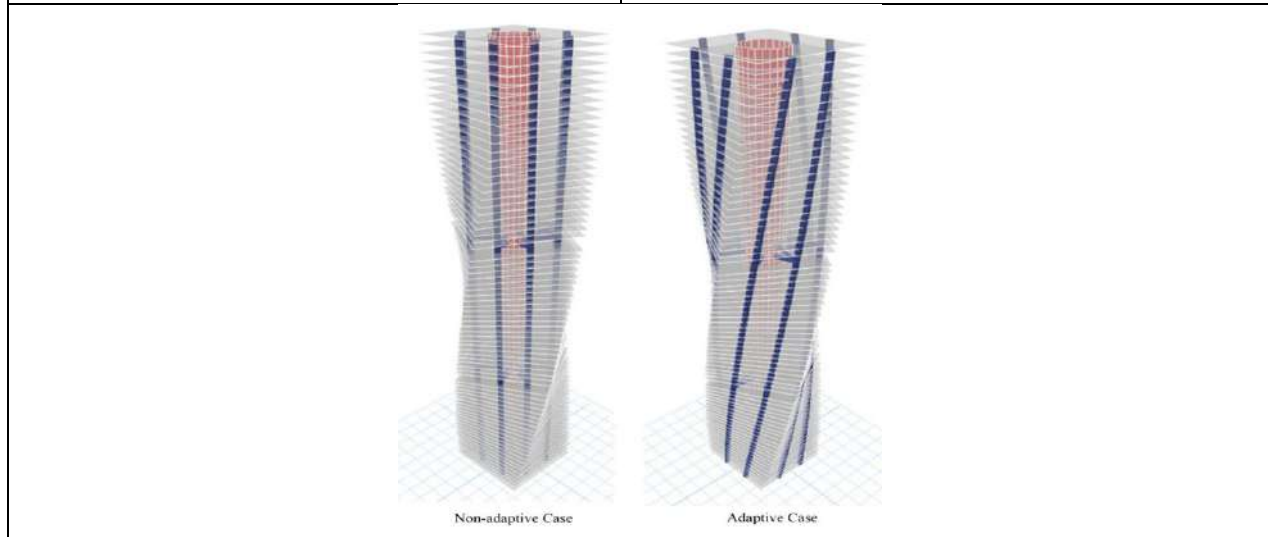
Structural approaches in twisted building (Source: Taşkın, 2019 [4].)
